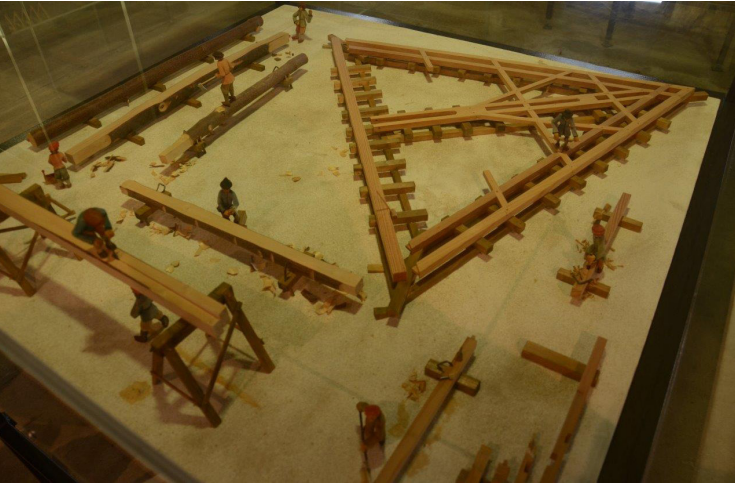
Building of an upper face roof truss on template. All timbers are joined on the upward side. Model in Bauhofstadel, Bad Windsheim.
